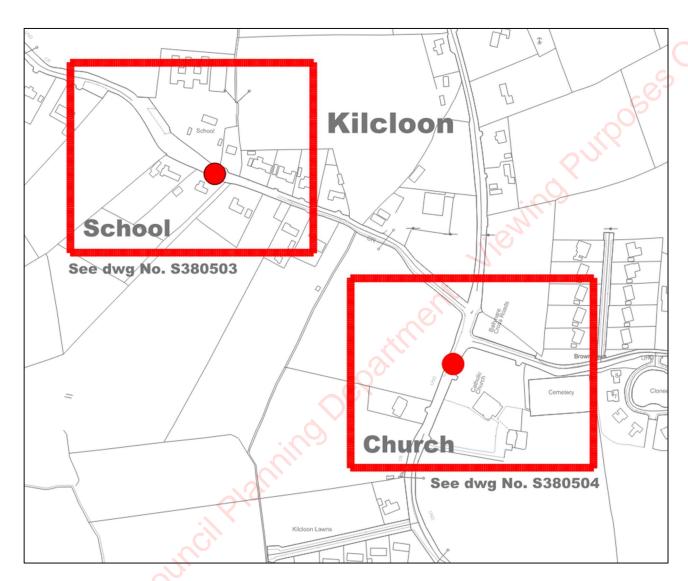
Proposed Site Location of Kilcloon Traffic Calming Scheme
